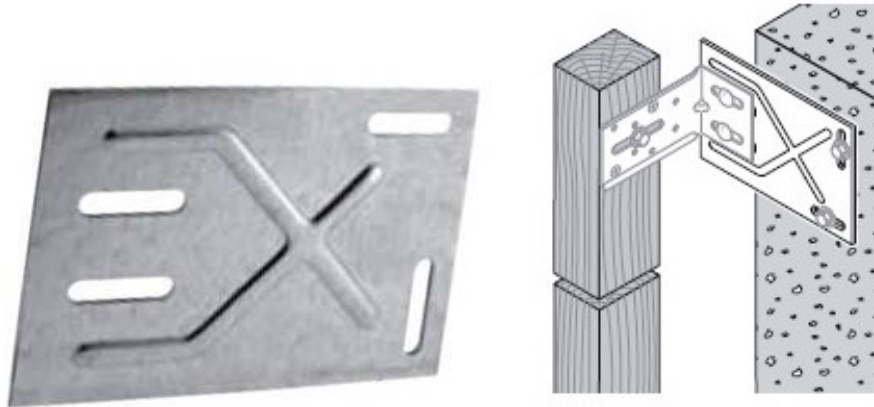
Auxiliary angle plate, galvanised steel Z350. Thickness: 2.5 mm
